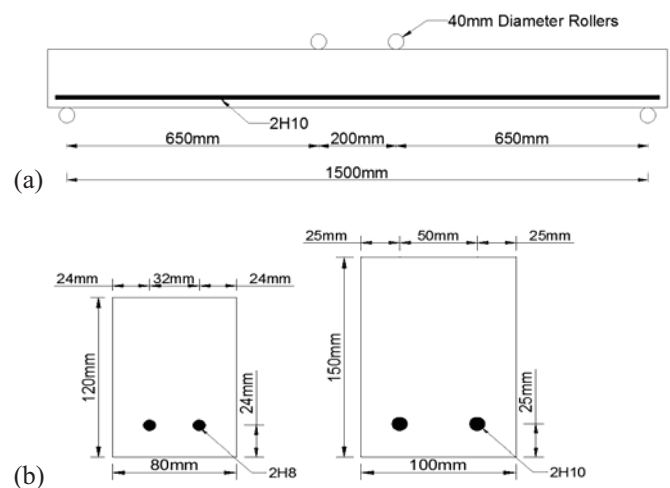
(a) 150mm beam longitudinal arrangement including loading and support locations and (b) Beam cross-section reinforcement arrangement.
